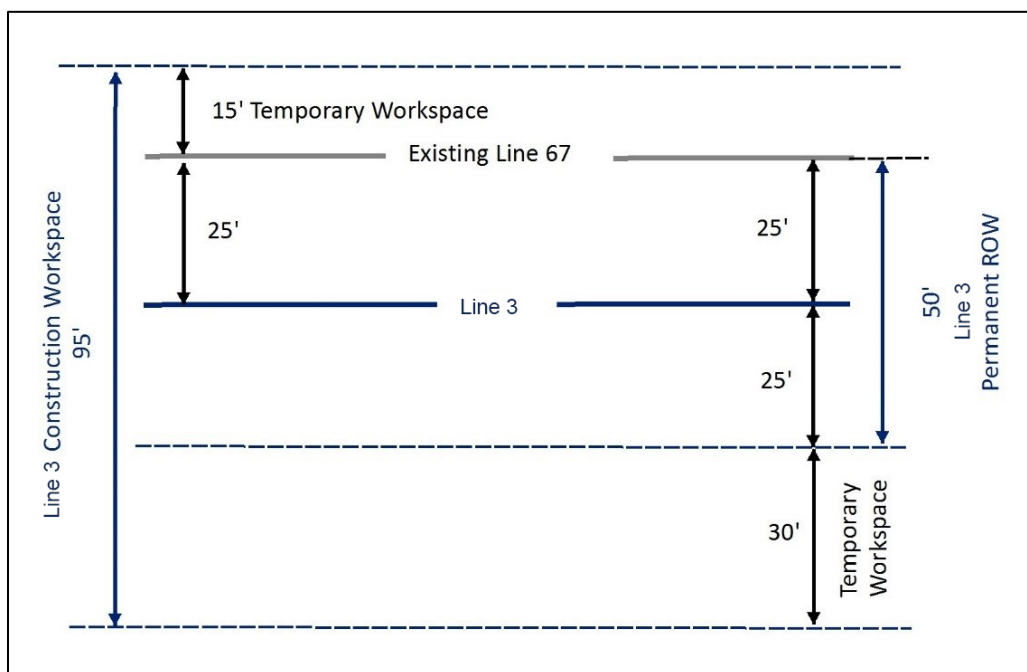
Plan View – Proposed Co-Location of the Proposed Line 3 Pipeline Right-of-Way with the Existing Line 67 Pipeline Right-of-Way in Wetlands
